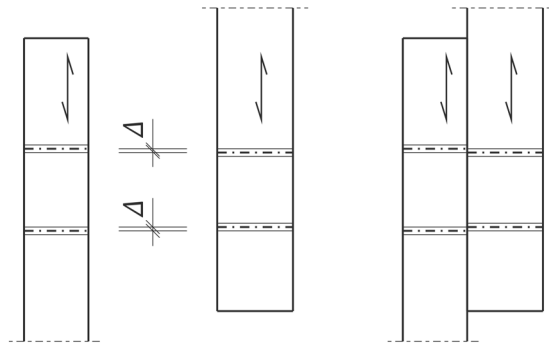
Offset Δ of axes for predrilled screws or rods, dowels or bolt holes drilled separately
